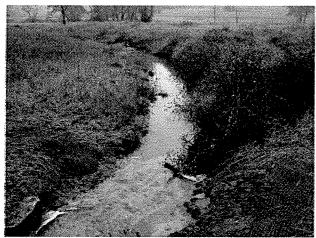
Rock cross vane installed at LT Station 7+36. (4/7/04)
